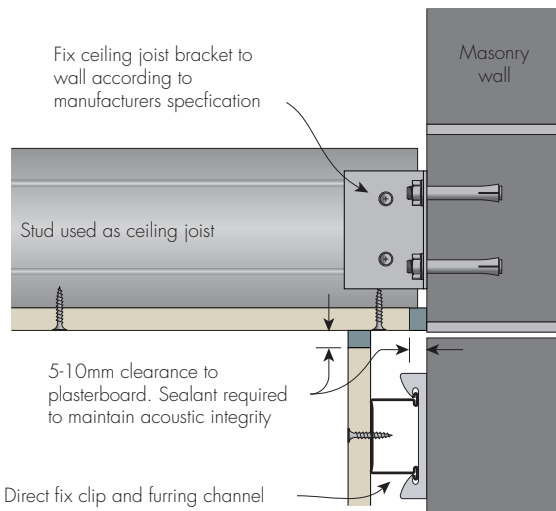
Non-Trafficable Ceiling to Masonry Wall
